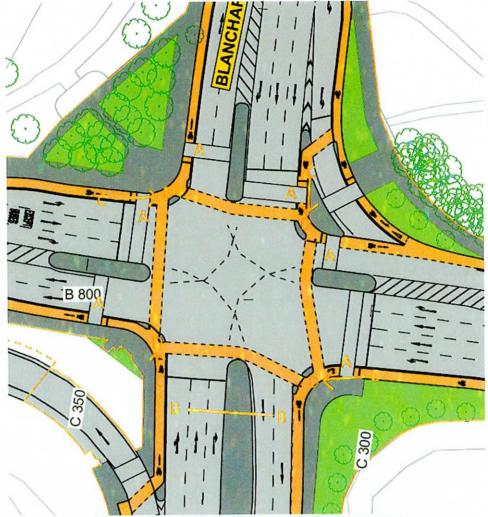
Junction at Blanchardstown Road and Old Navan Road
